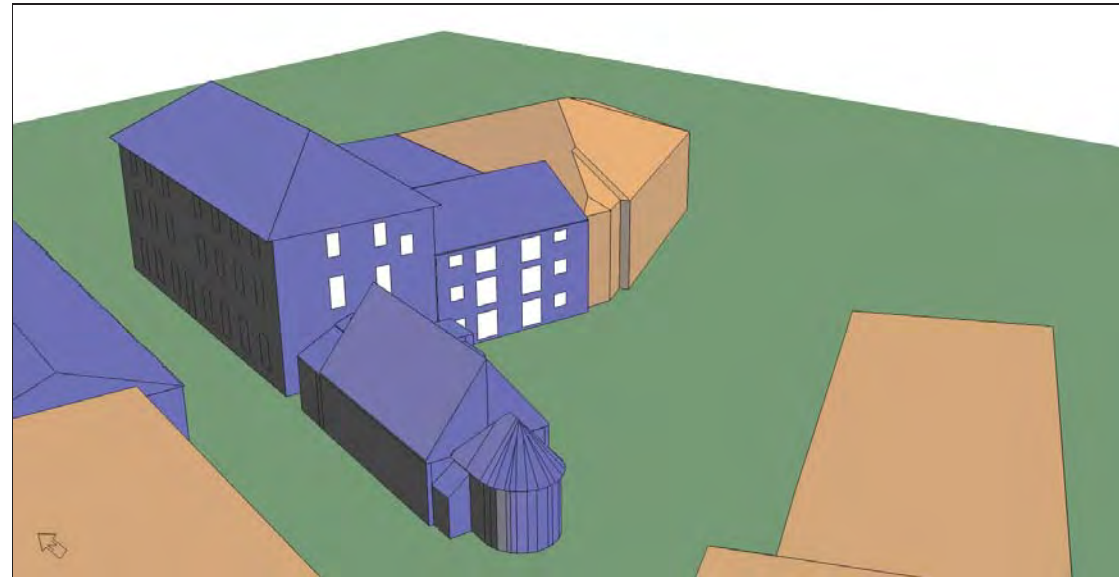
3D Model image showing proposed extension and new church spire to the Mission Gallery and critical adjacent buildings, namely the south-facing façades of Gloucester House and Marina.
